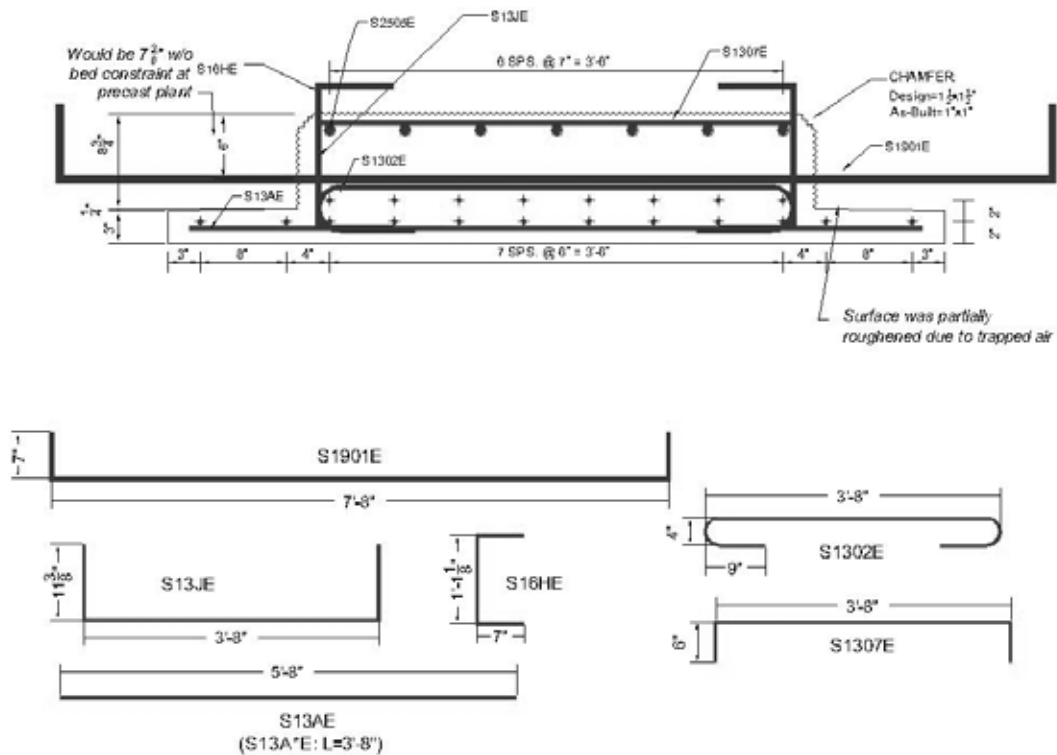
As-built cross section and reinforcement details for the east end of Beam 1N
